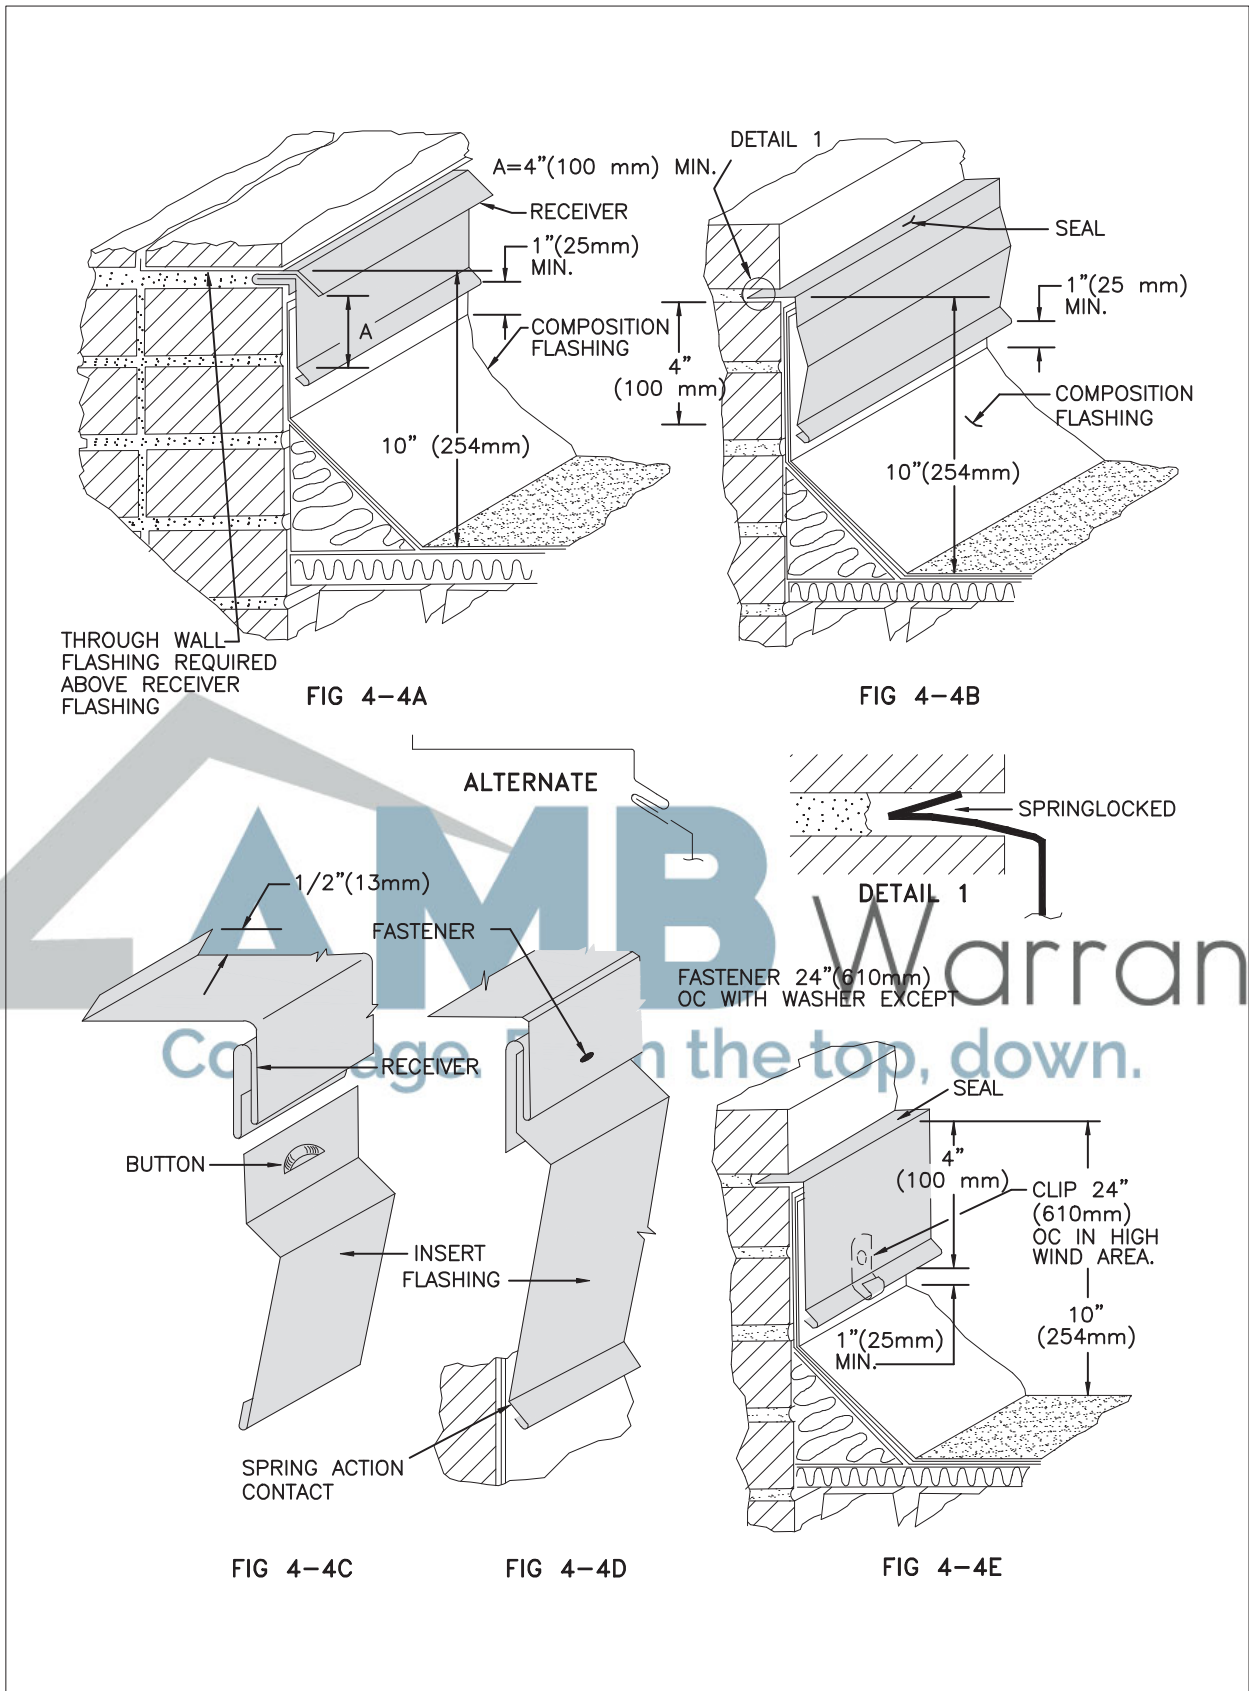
COUNTER FLASHING SYSTEMS — INSTALLATION
